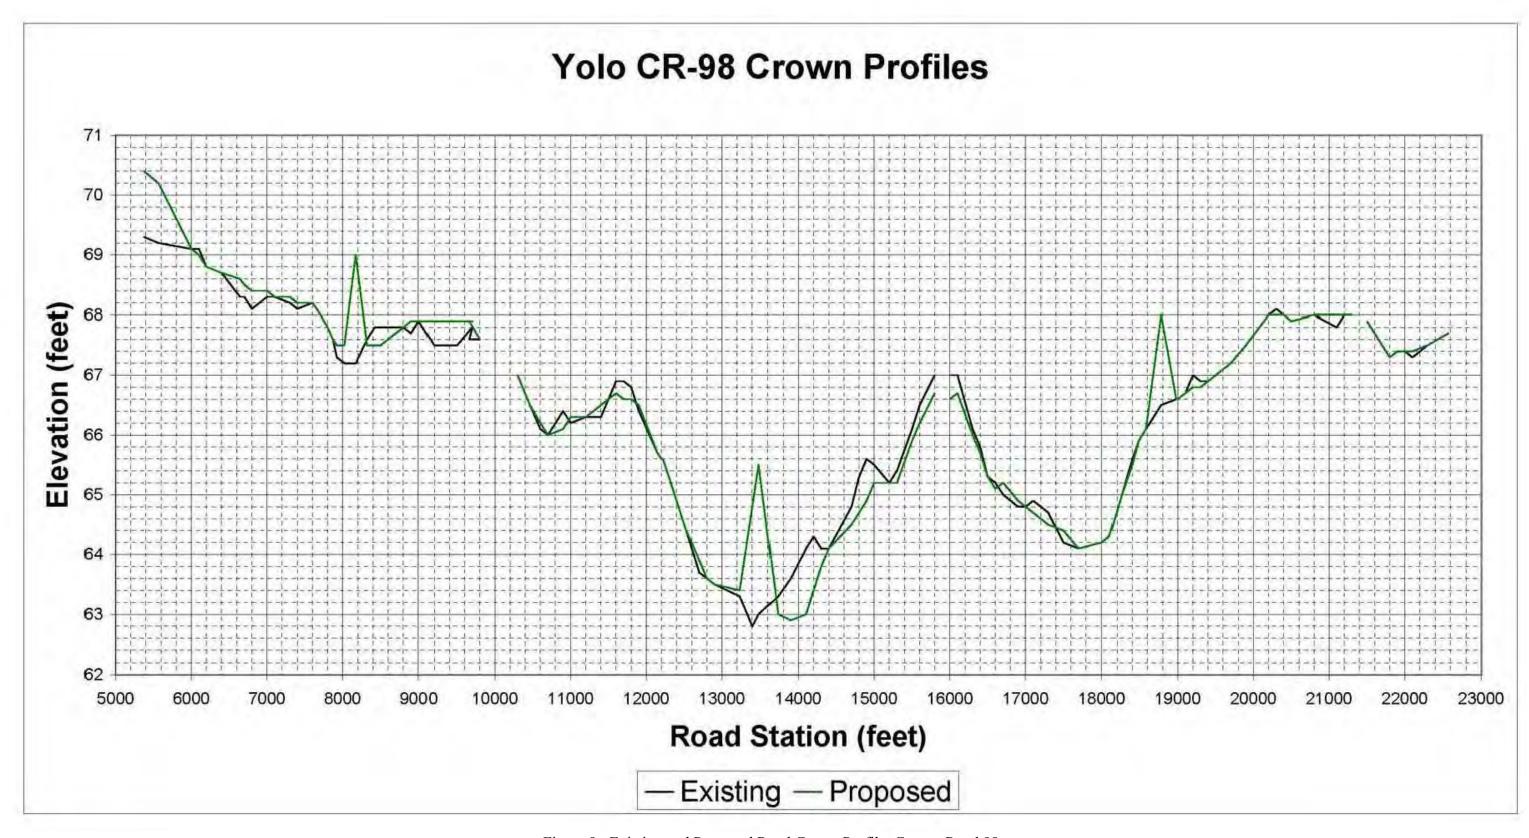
Existing and Proposed Road Crown Profile, County Road 98
